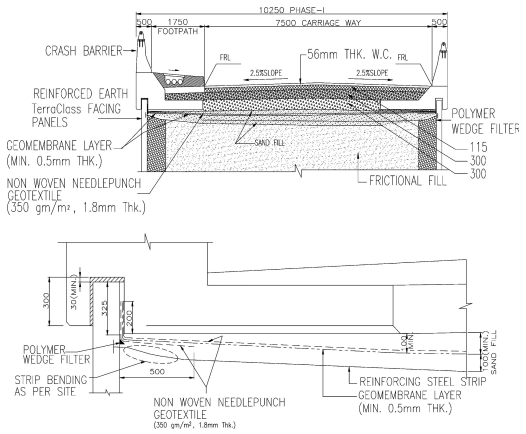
Geomembrane detailing at top to prevent salt percolation and corrosion steel strip.
